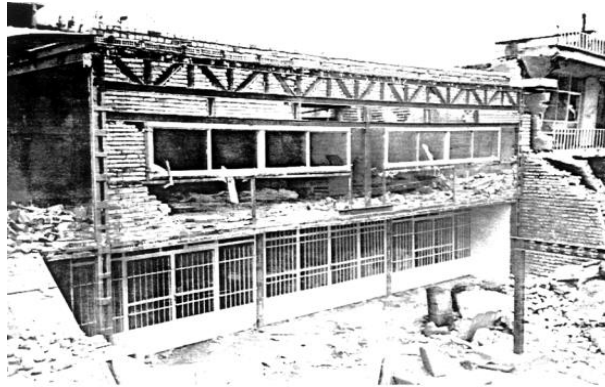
Case of heavy damage due to failure of infill panels in the steel frame, observed during 1990 Manjil earthquake (Mahen & Grove, 1990)
